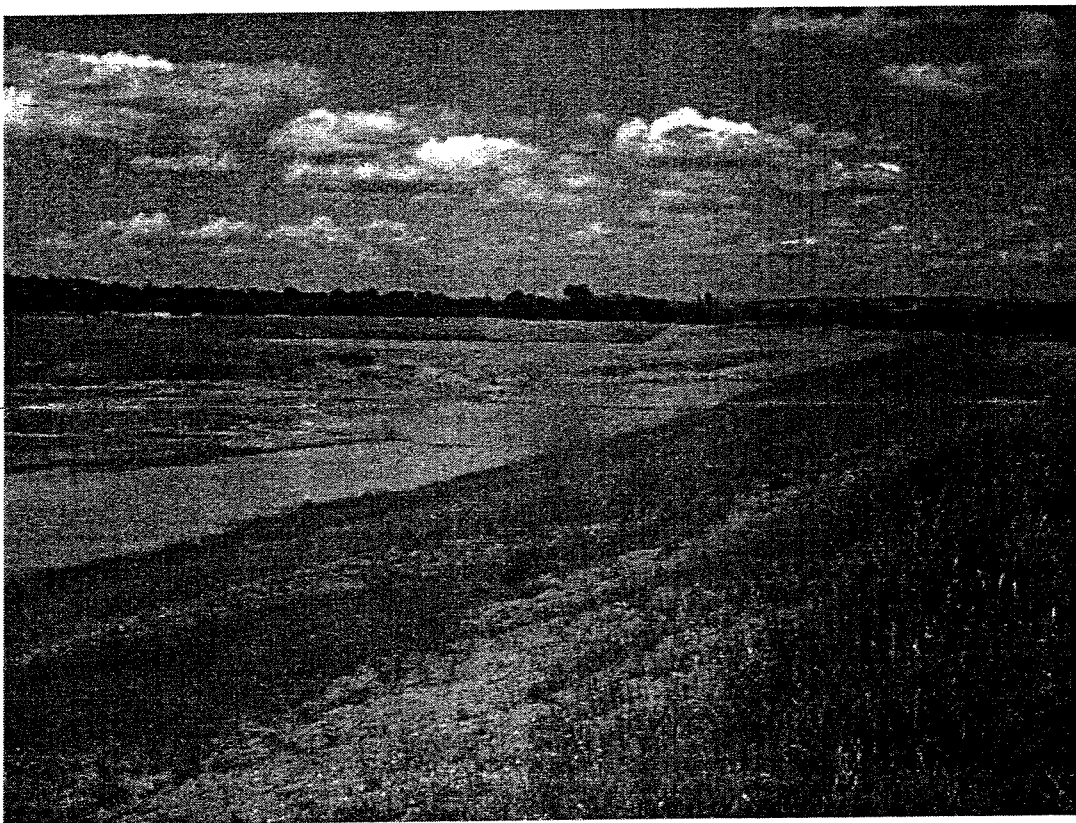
View Looking Northeast, Re-Contoured 3:1 Slope
